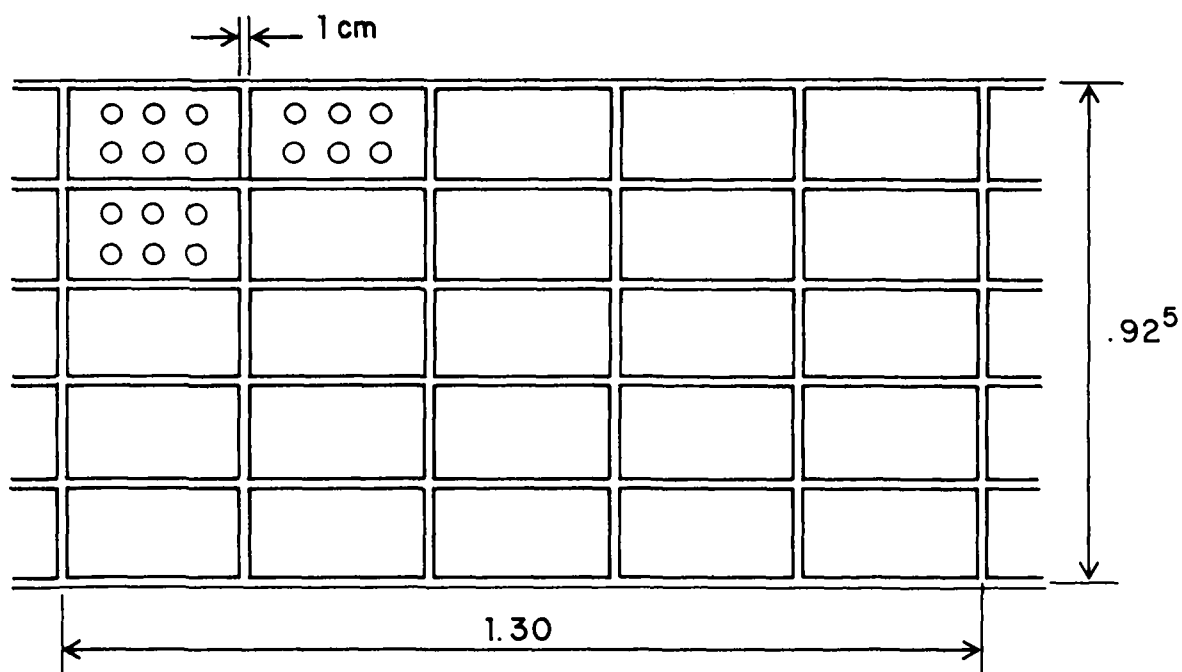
BLOCKS RECOMMENDED FOR SEPARATING THE WALLS OF HORIZONTAL ROUGHING FILTERS (After M. Campos)
